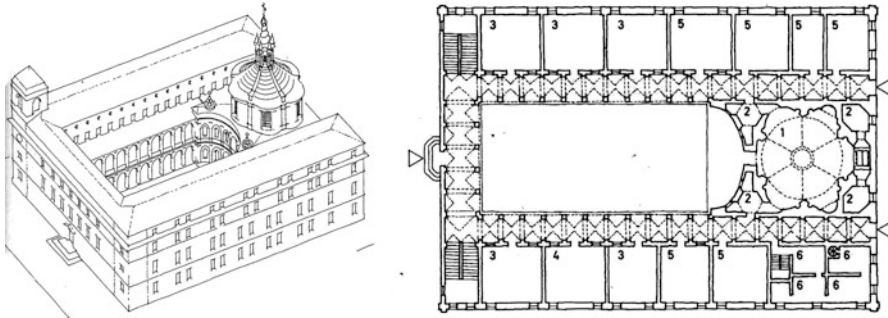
Isometry and floor plan of La Sapienza, Rome.
